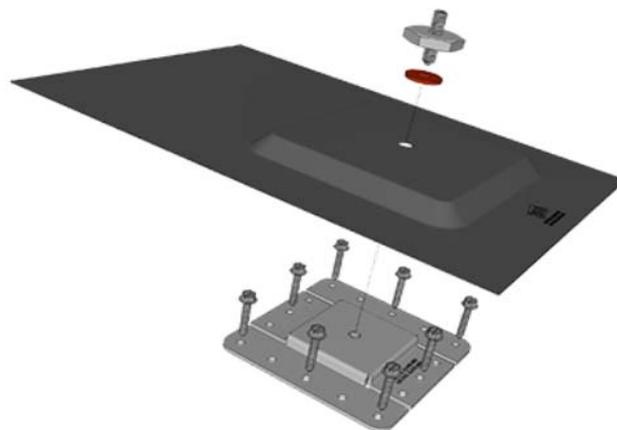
The Zilla® Double Stud XL Flashing attaches to sheathing or structural members of the roof, not required to be fastened to the roof rafters. [37]
